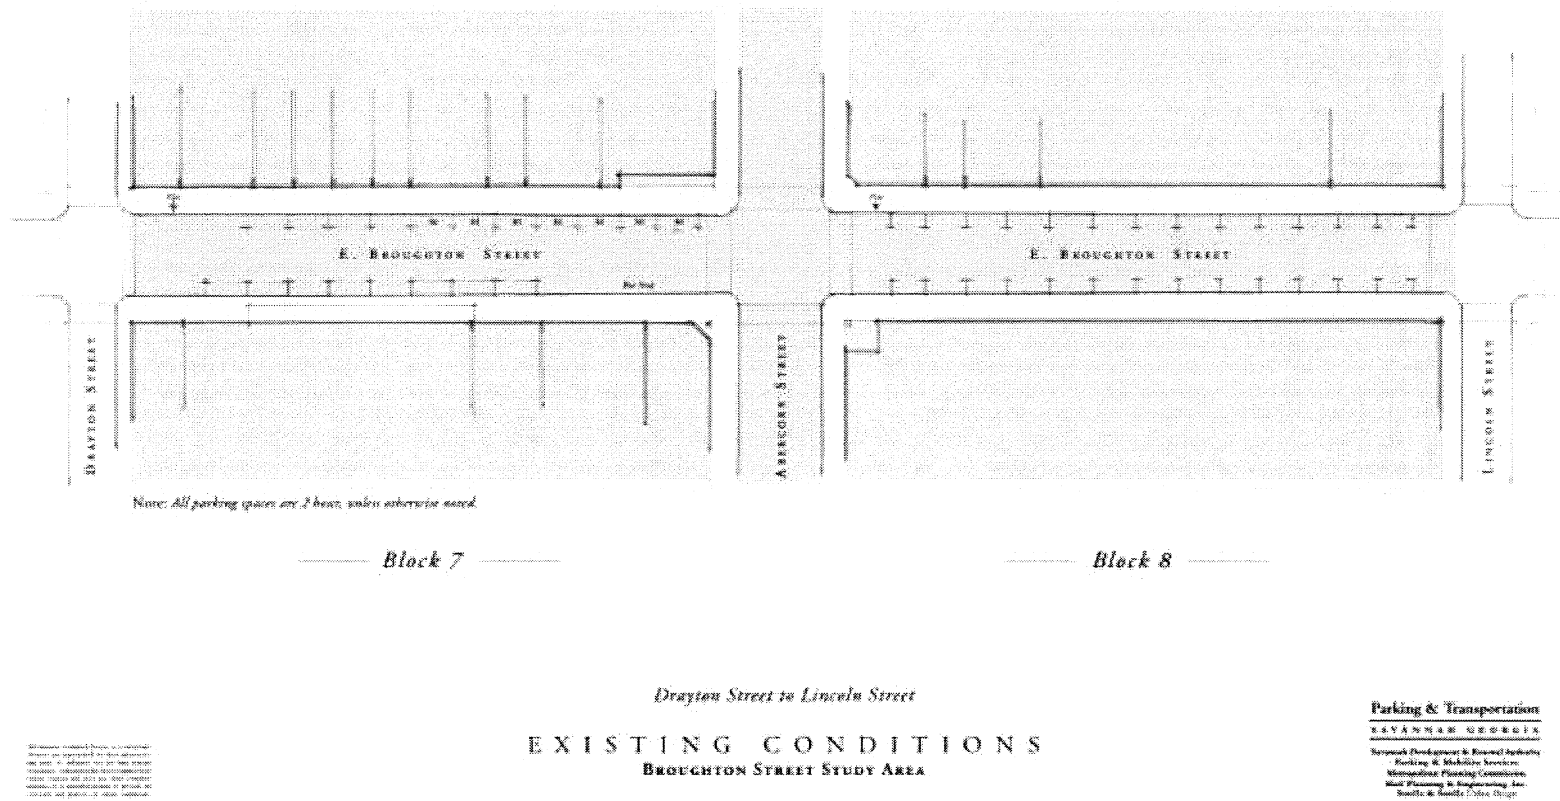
Broughton Street Existing Conditions (Blocks 7 and 8; Drayton Street to Lincoln Street)
